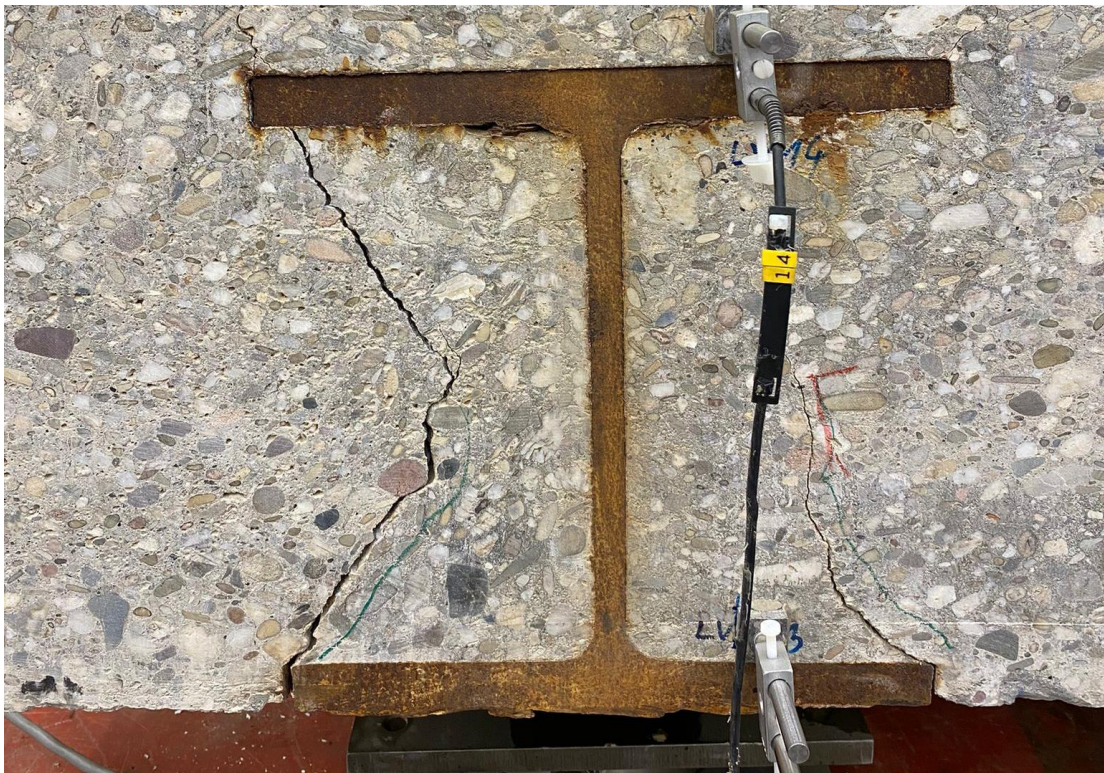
LB1. Cracks between flanges of beam 1 at the east end after testing.
